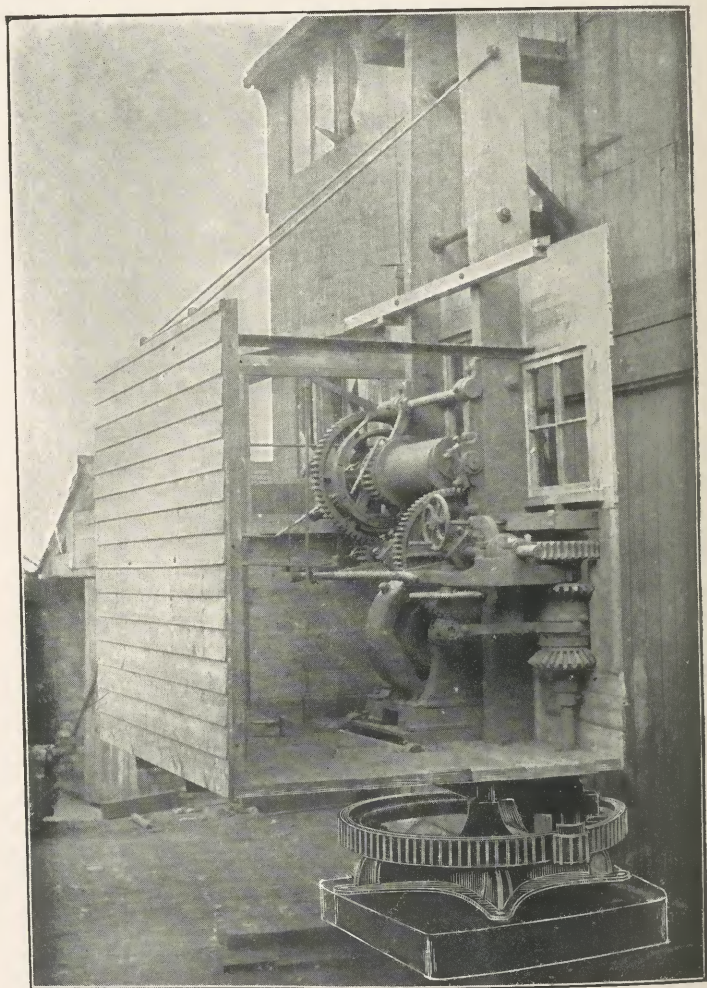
Mast of a 3-ton Electric Derrick Crane (side of cabin removed to show gearing).
